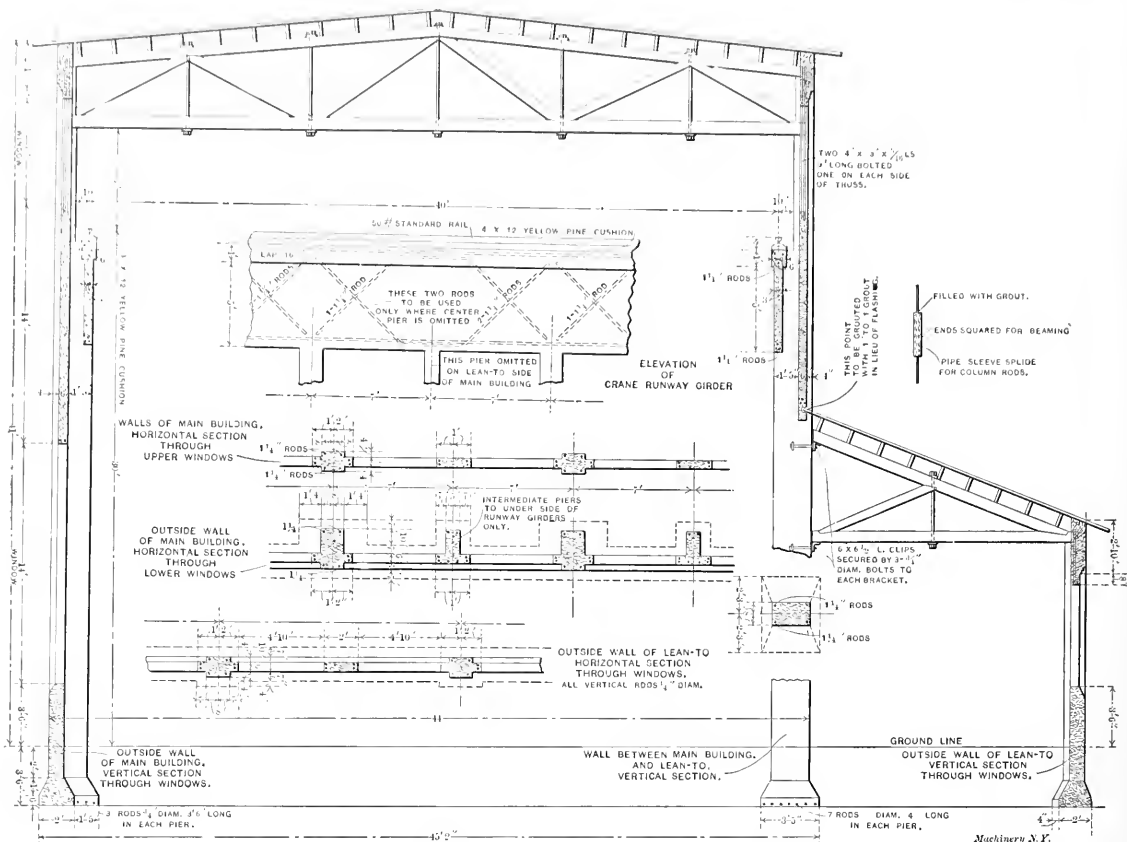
Cross-section of Building, Details of Reinforcement, Etc.
